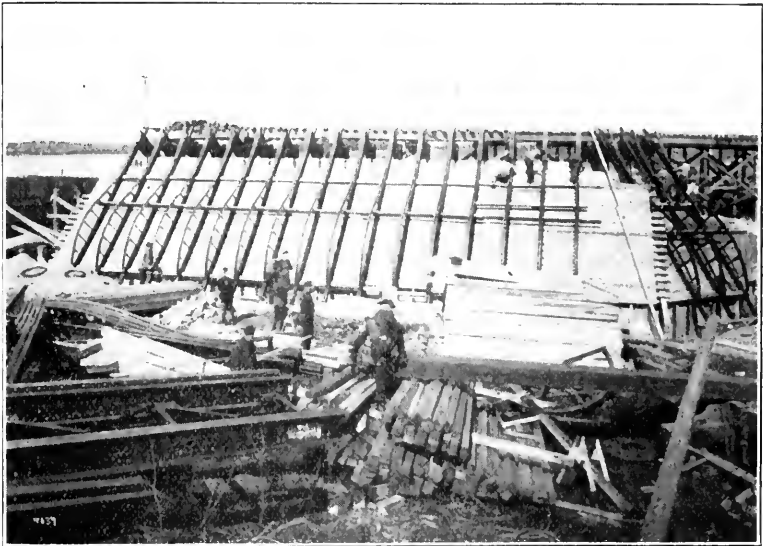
Ribs for Spillway Forms in Use on Retaining Dam.
